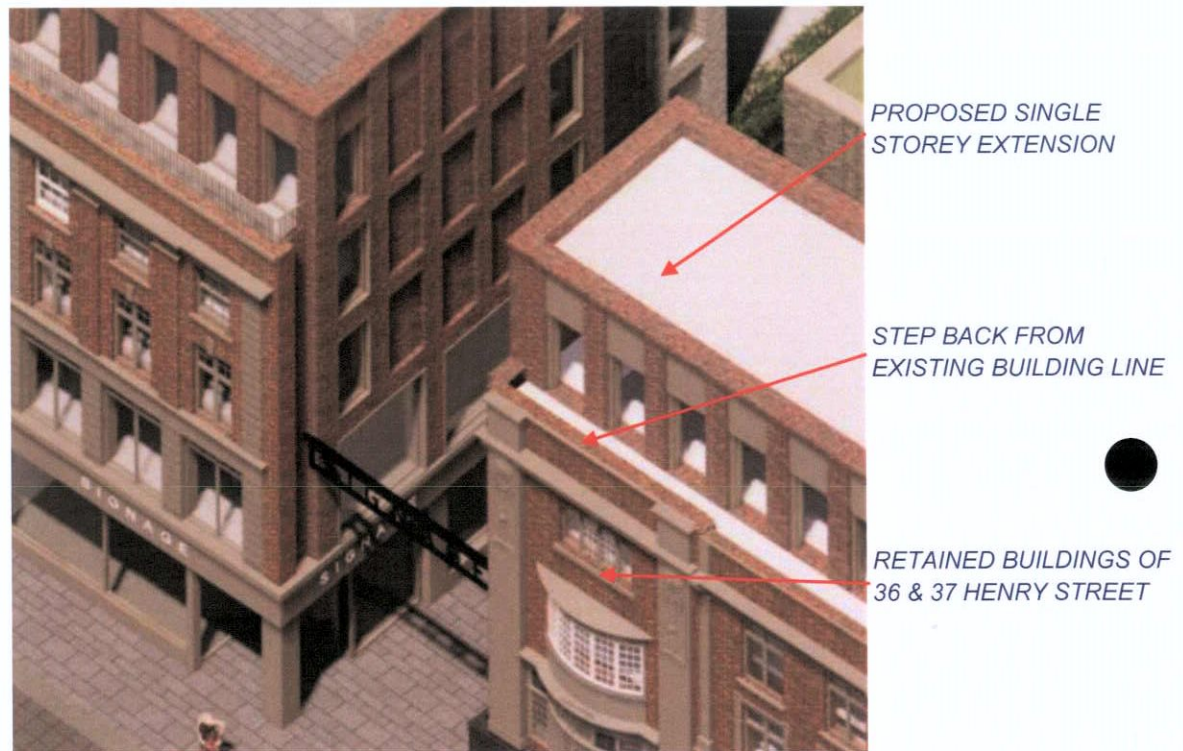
Proposed Single Storey Extension of Retained Buildings at 36 and 37 Henry Street
